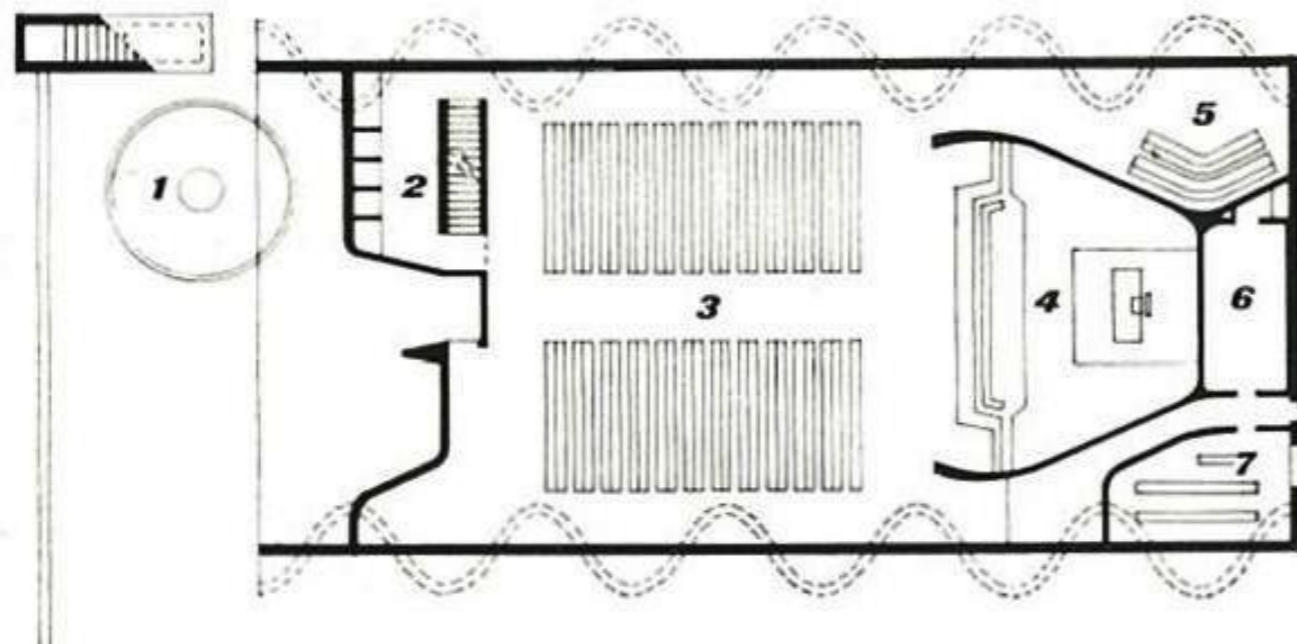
Church of Christ the Worker, Floor Plan and Exterior Conoidal Reinforced Brickwork, by Eladio Dieste, Atlantida, 1960.
